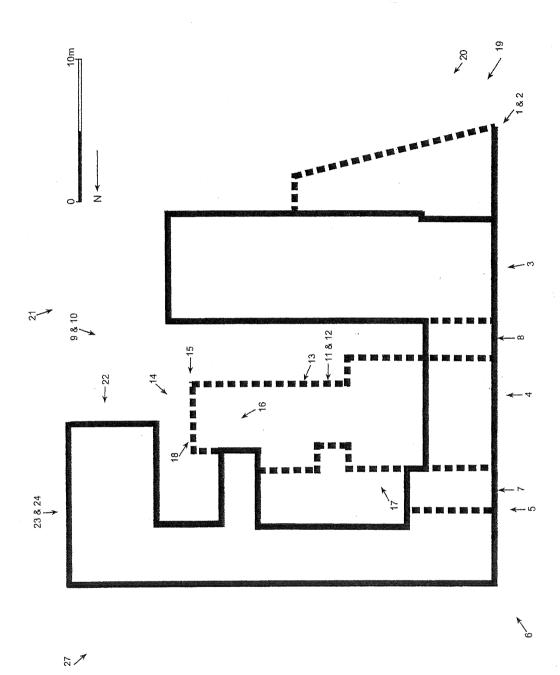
Direction of external photos (Based on original drawings by BLB Architects of Redditch
